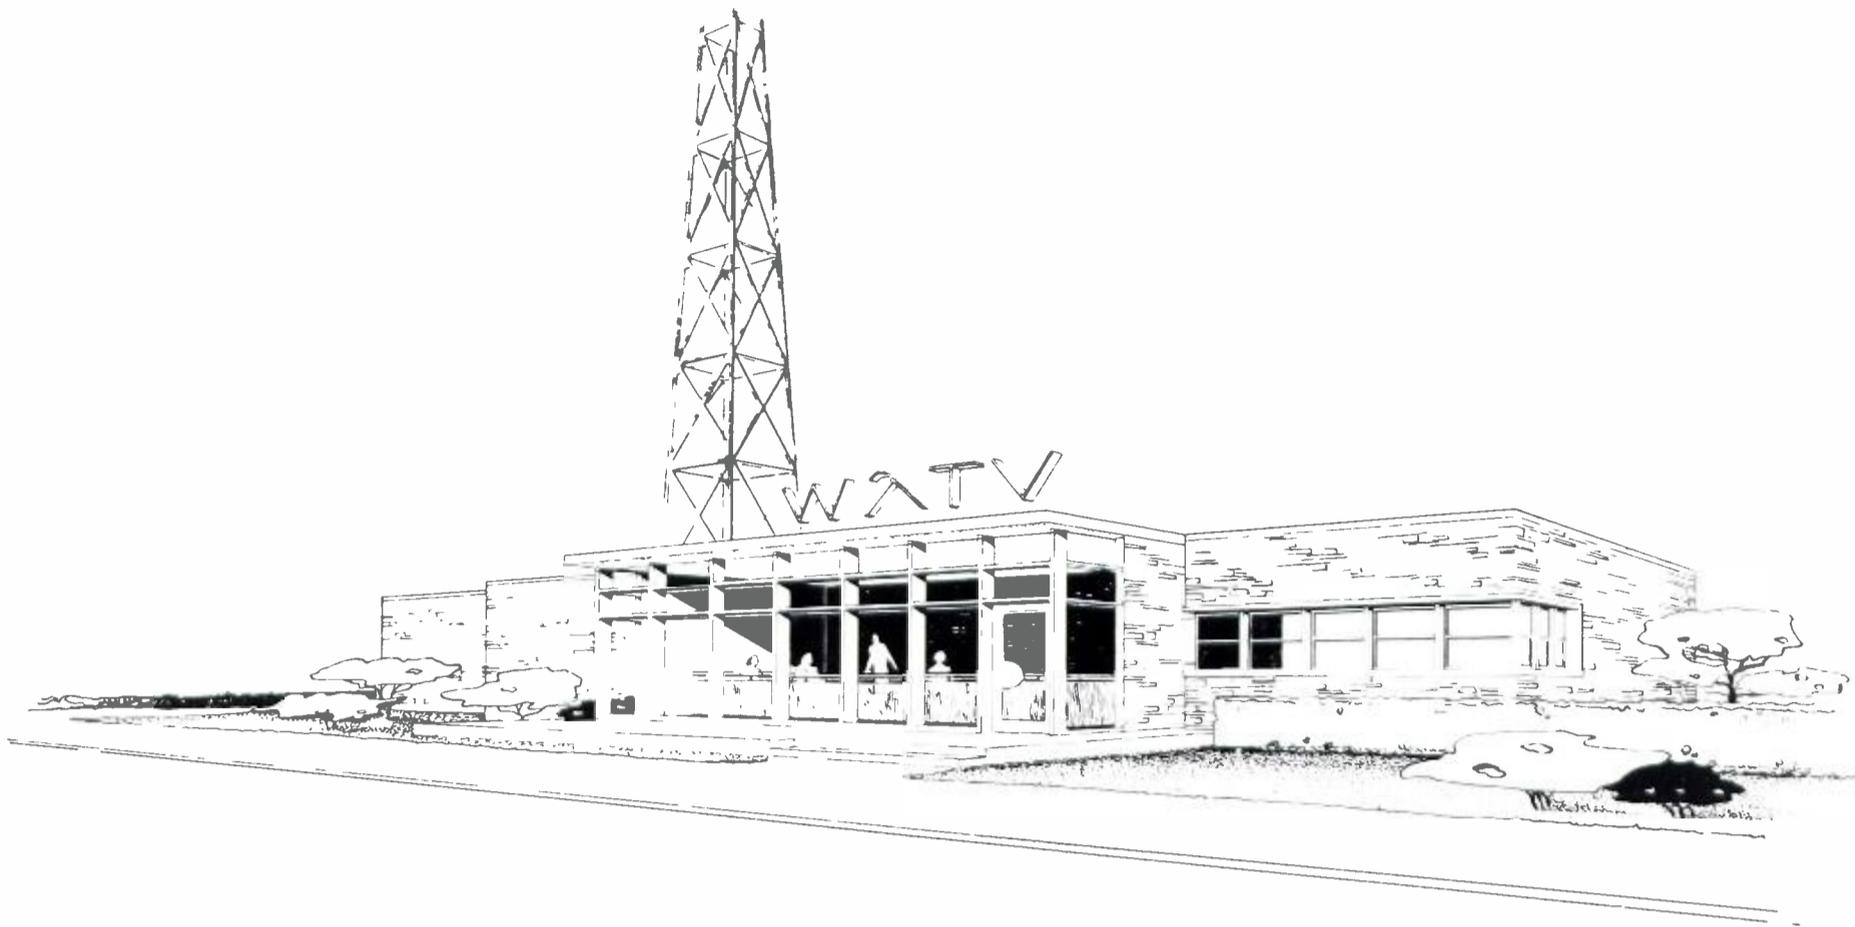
(above). Building designed to house offices, studios and transmitter of a small television station.
